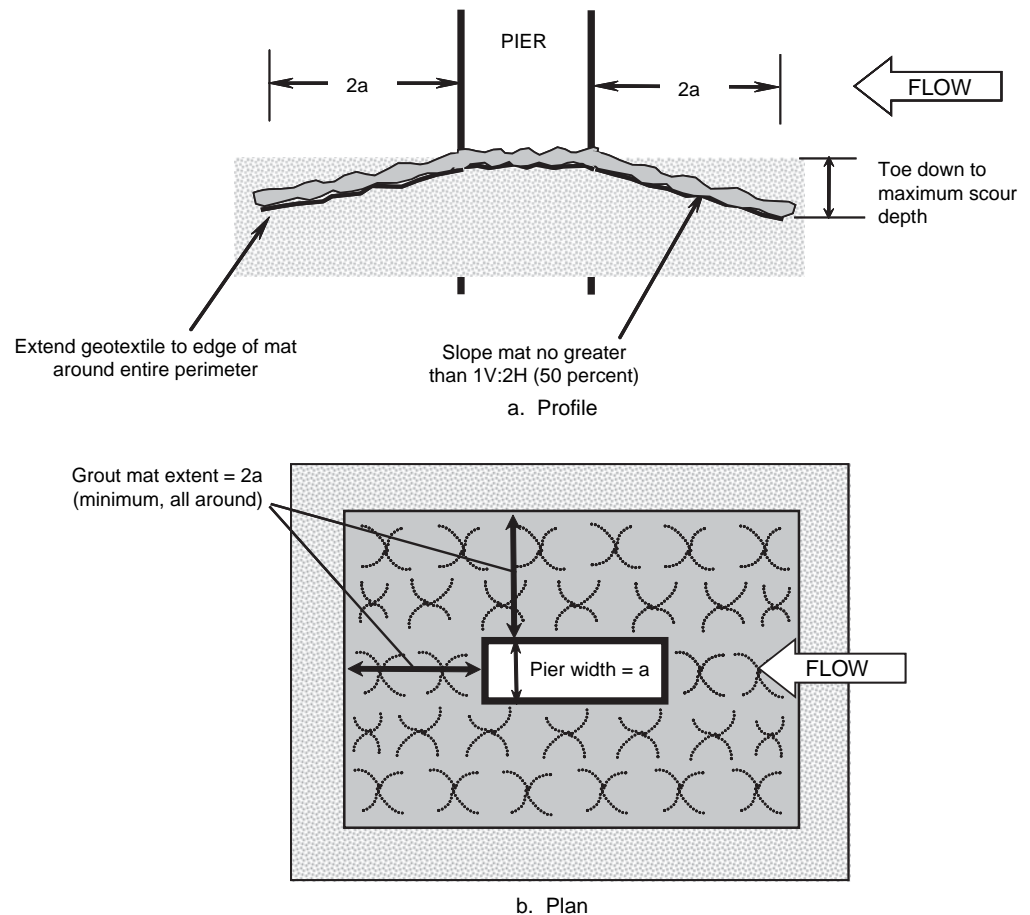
Grout-filled mattress layout diagram for pier scour countermeasures.
